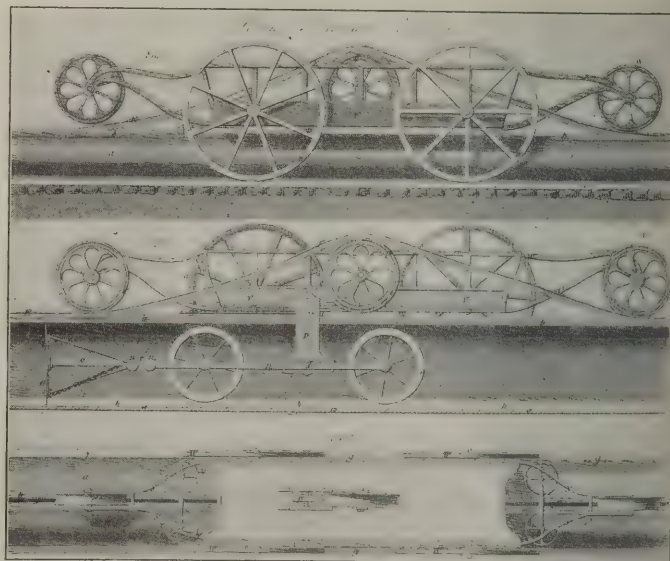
Side Elevation, Side Section and Plan of the Pinkus Pneumatic Railway.—From an Old Print.
